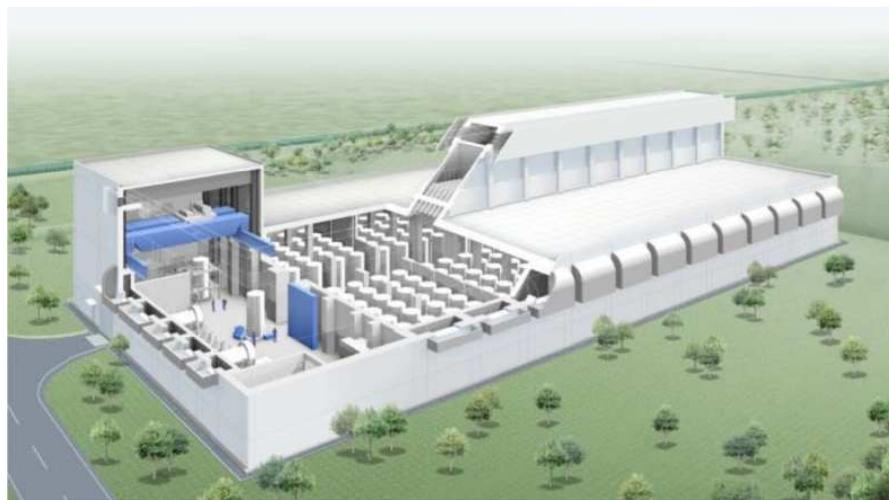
Cutaway view of the future centralised storage facility at Mutsu (Japan)
